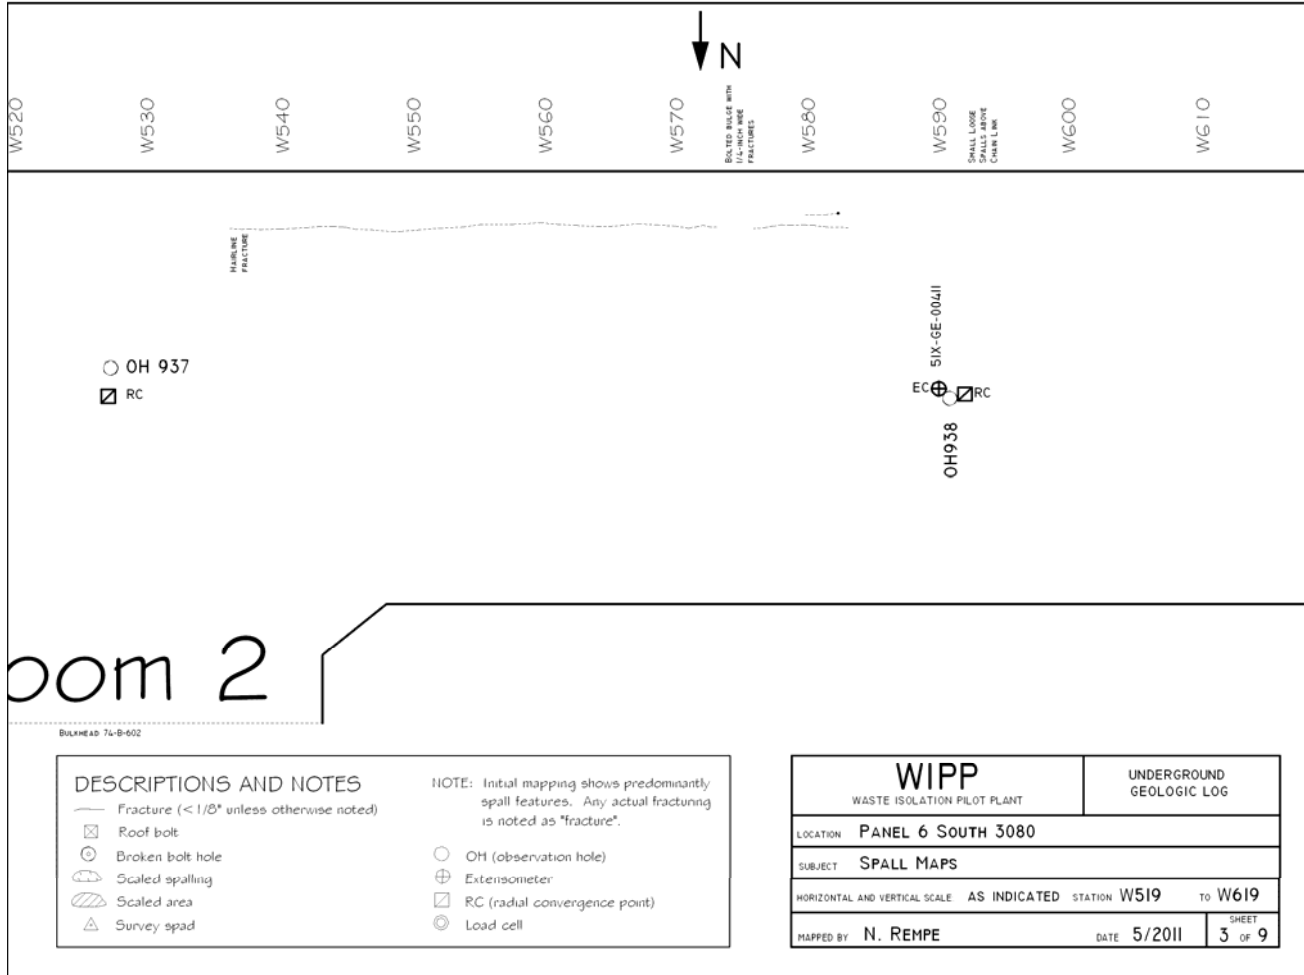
Panel 6 S3080, W390-W1210 Roof Fractures (Sheet 3 of 9)
